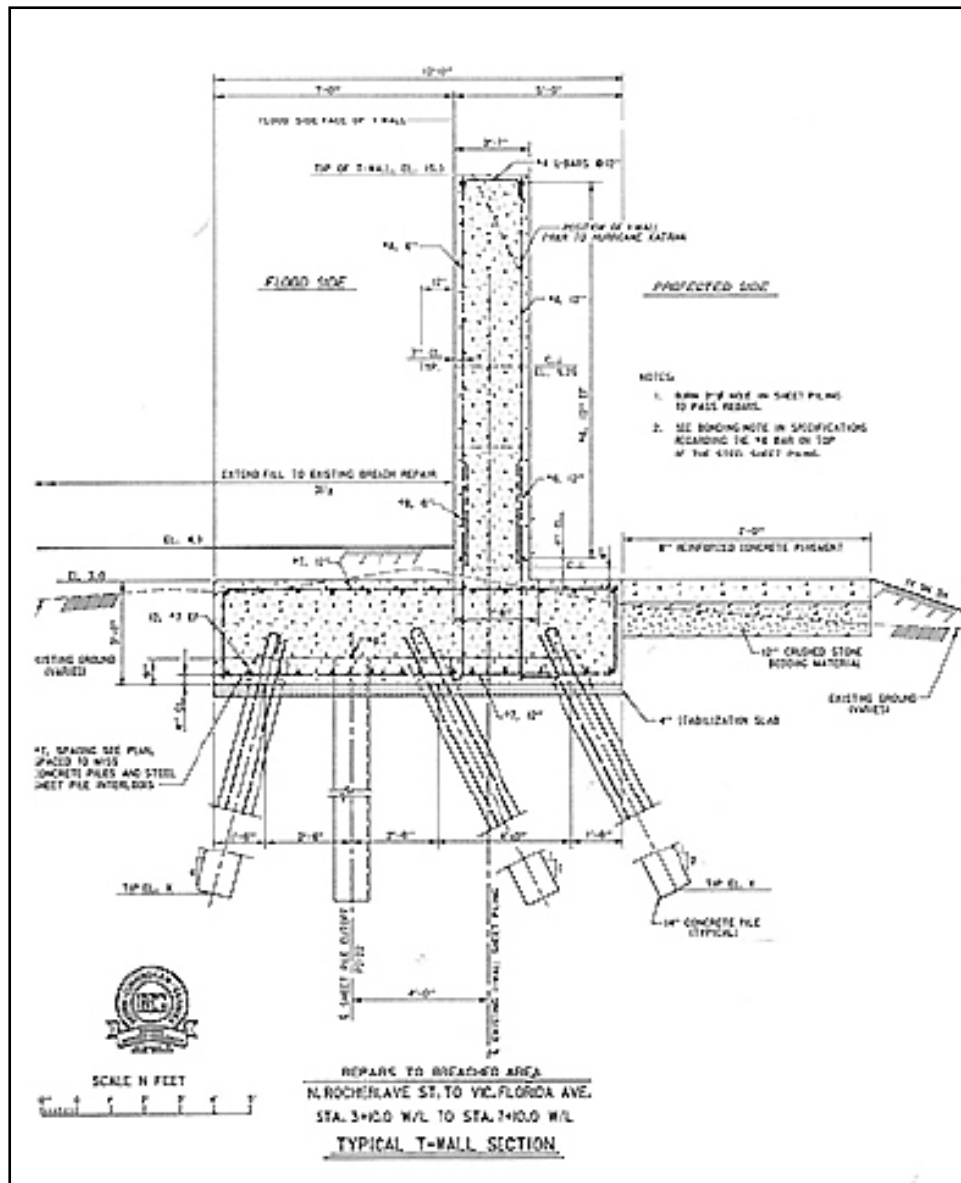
New "Kicker Wall" Design, Sta 3+00 to 7+00
